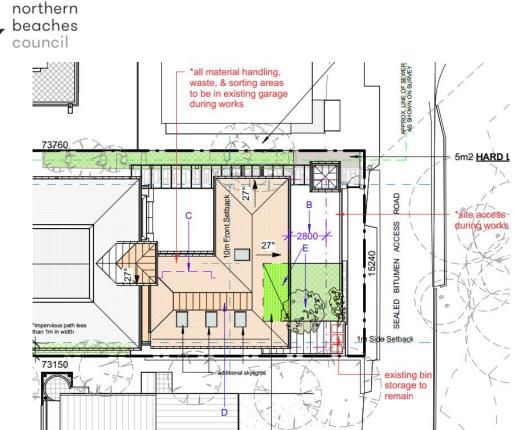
Extract of Amended Site Plan showing proposed first floor additions
